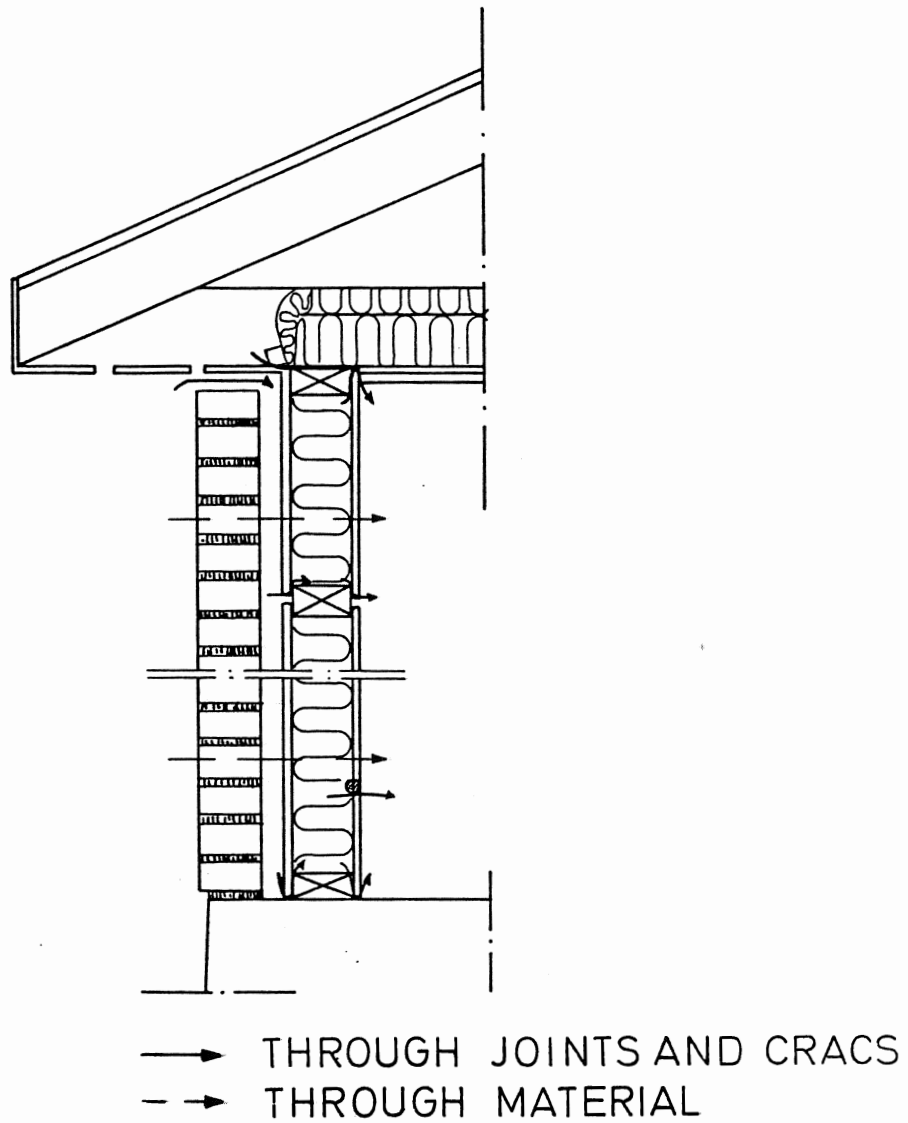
Principal ways of air-flow through insulated cross-bar structure with air-space and outer brick wall.
